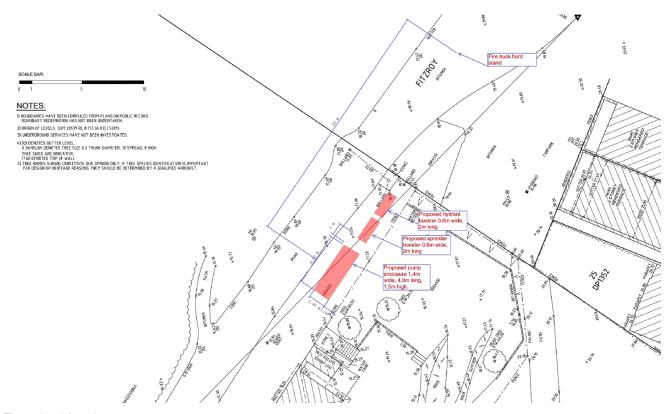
(above) Plan of the proposed locaiton of a sprinkler booster and valves, adjacent to the rear yard of the Elkington Park Caretaker's Cottage Source: TKD Architects
